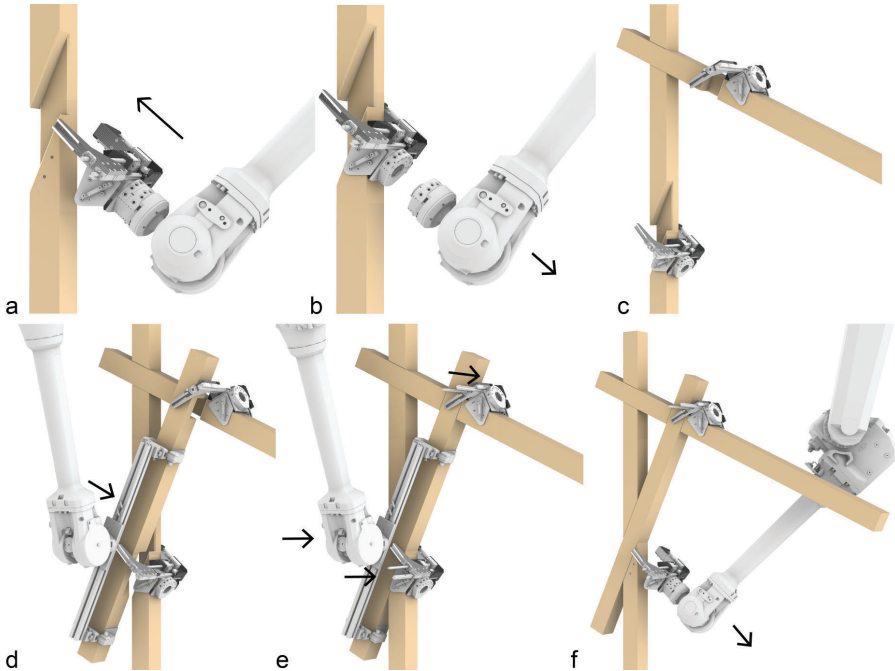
Robotic arm moving clamp to joint. (b) Clamp detach from arm. (c) As many clamps as necessary are placed. (d) Robotic arm brings a new element in the clamp jaw using a gripper. (e) Element assembled by arm and clamps. (f) Clamps removed by robot, one at a time.
